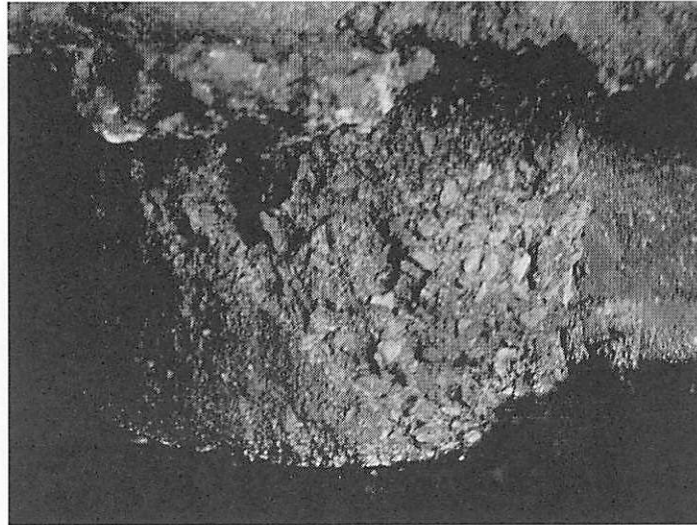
to Figure 51 are some examples of the misshaped column found in this study. Fortunately, there was no observable severe damage in these columns. However, the structural capacities of these columns are surely downgraded by eccentricity and urgent action should be done to confirm a stability of the bridges. In the necessary case, the column may be enlarged to efficiently transfer the load from superstructure to the foundation.
